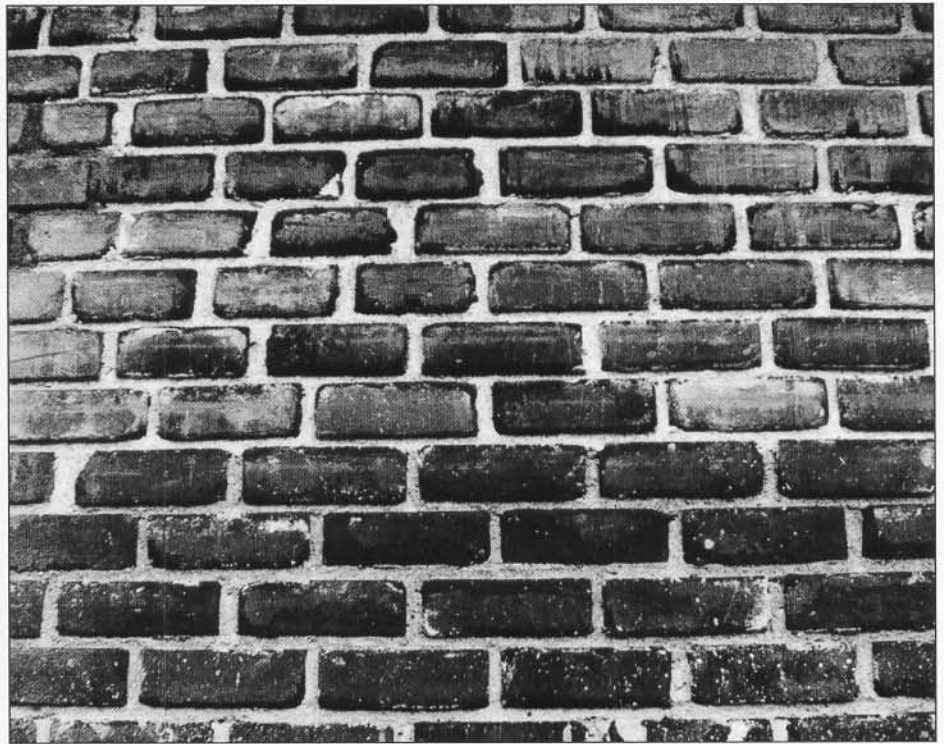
Close-up of brick masonry of BRI red mud demonstration building
